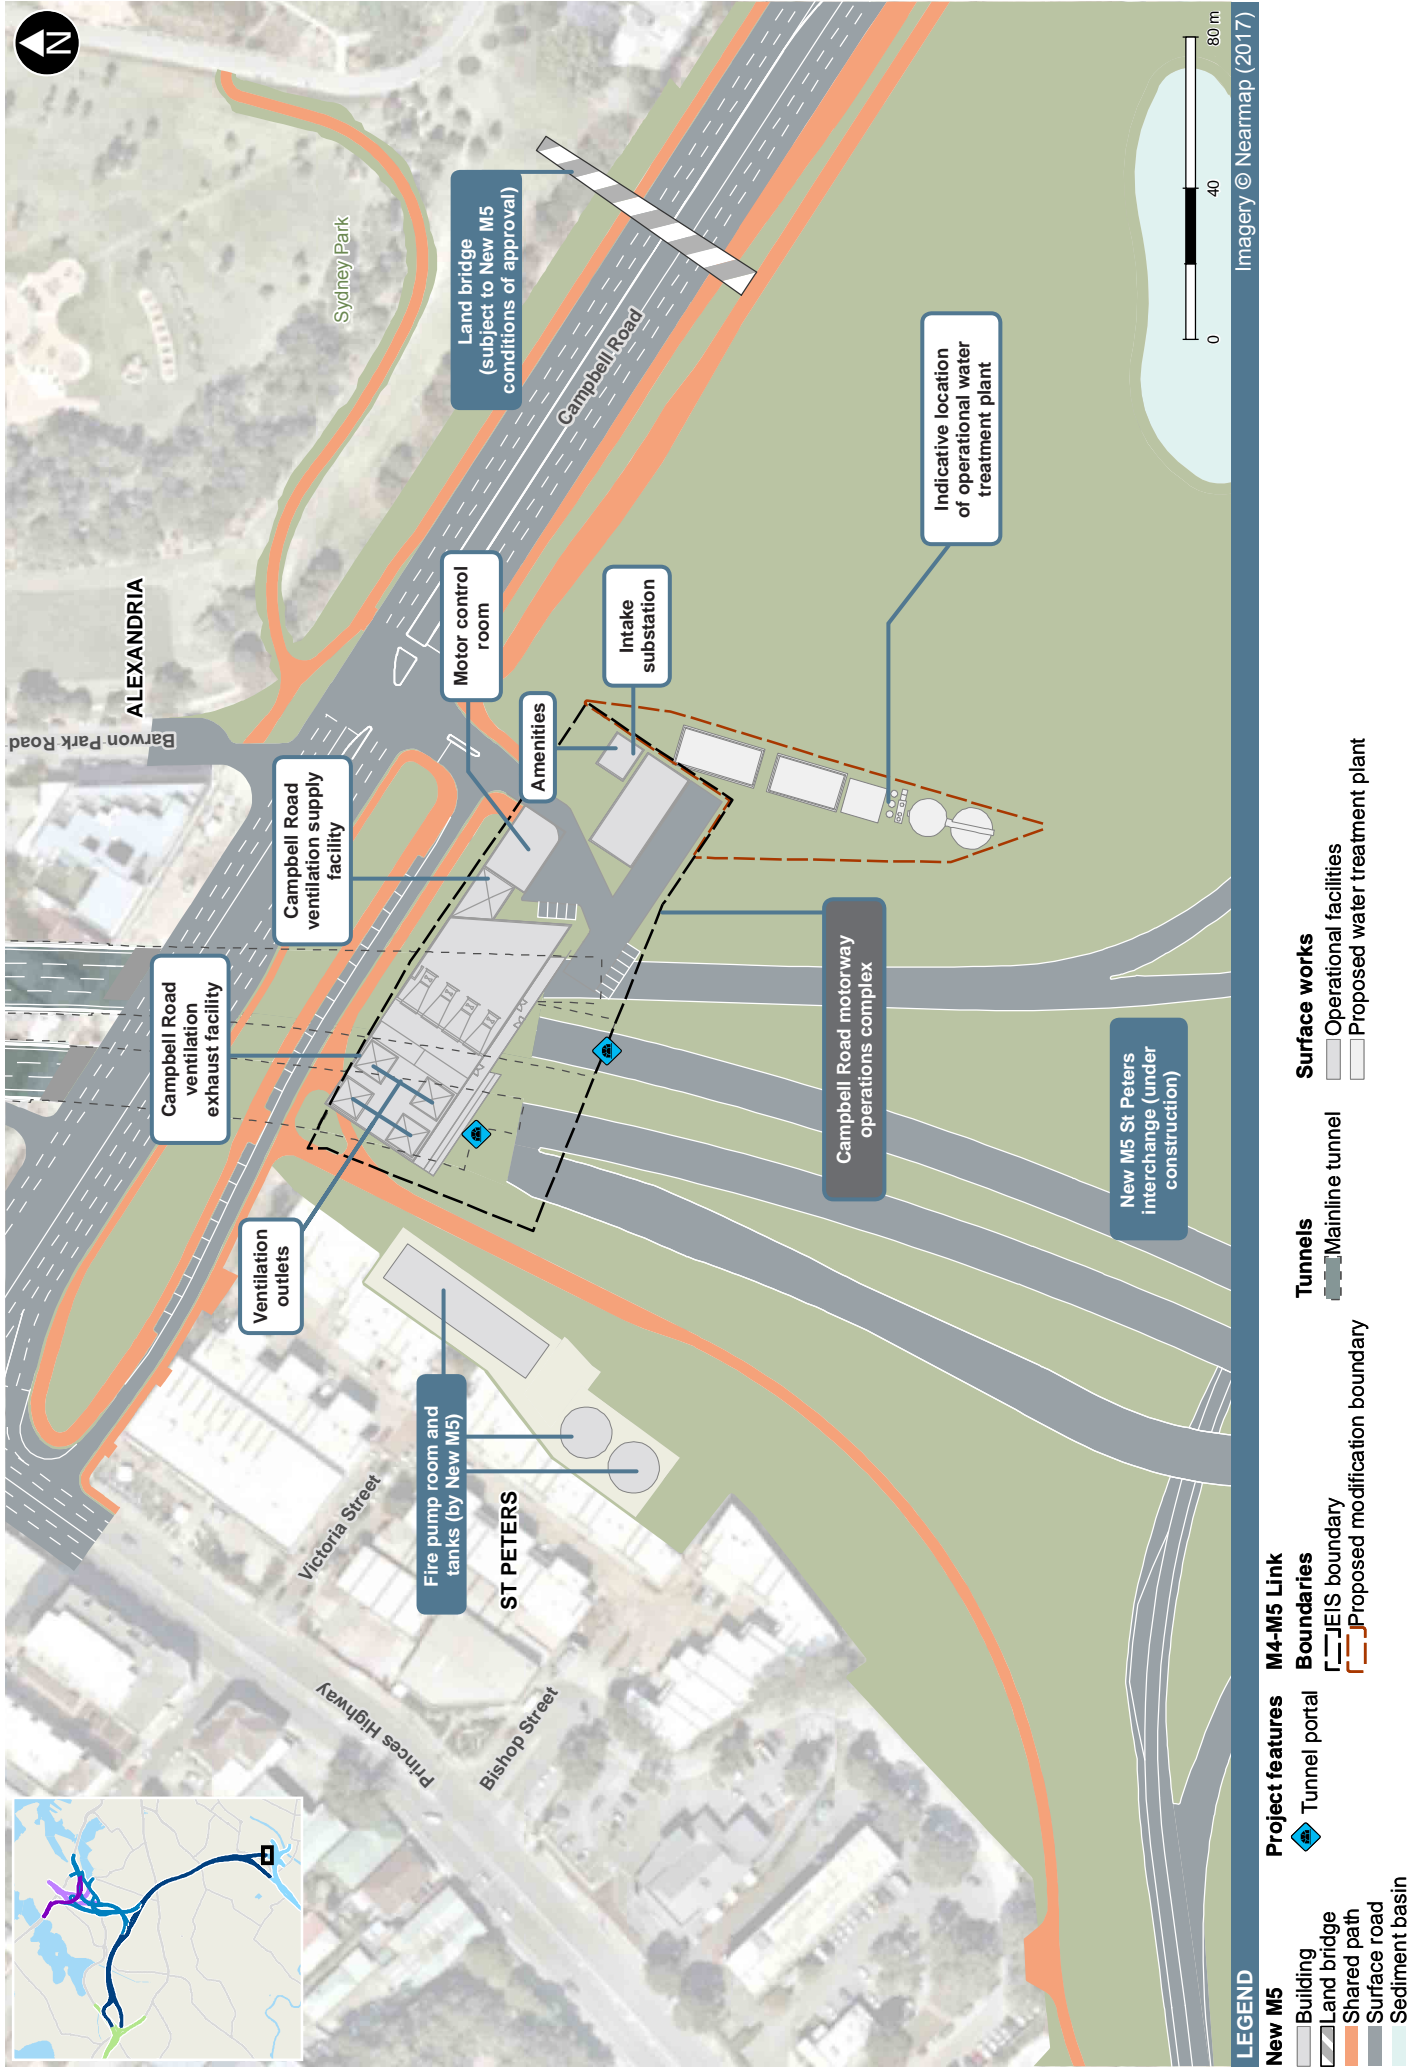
Campbell Road MOC indicative layout including proposed water treatment plant
